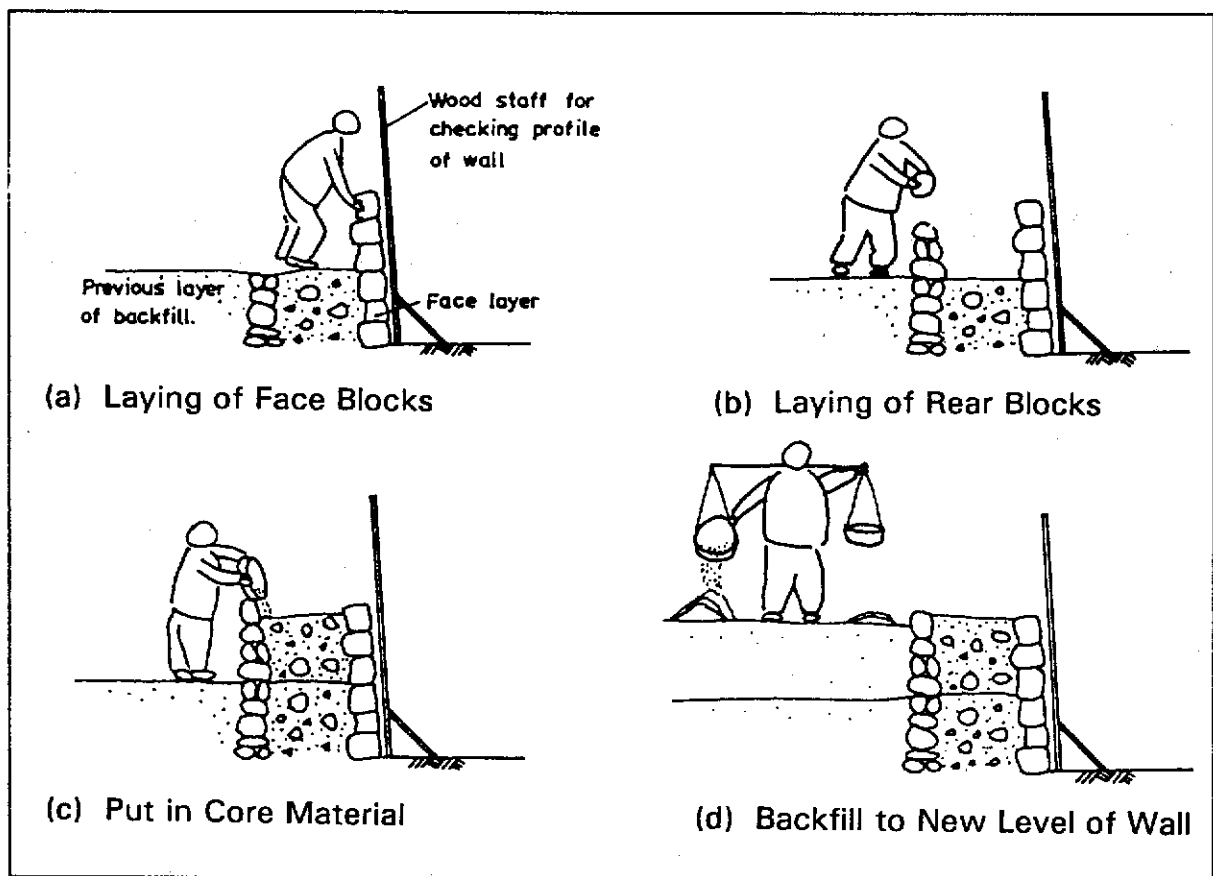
Method of Construction of Old Stone Rubble Retaining Walls
